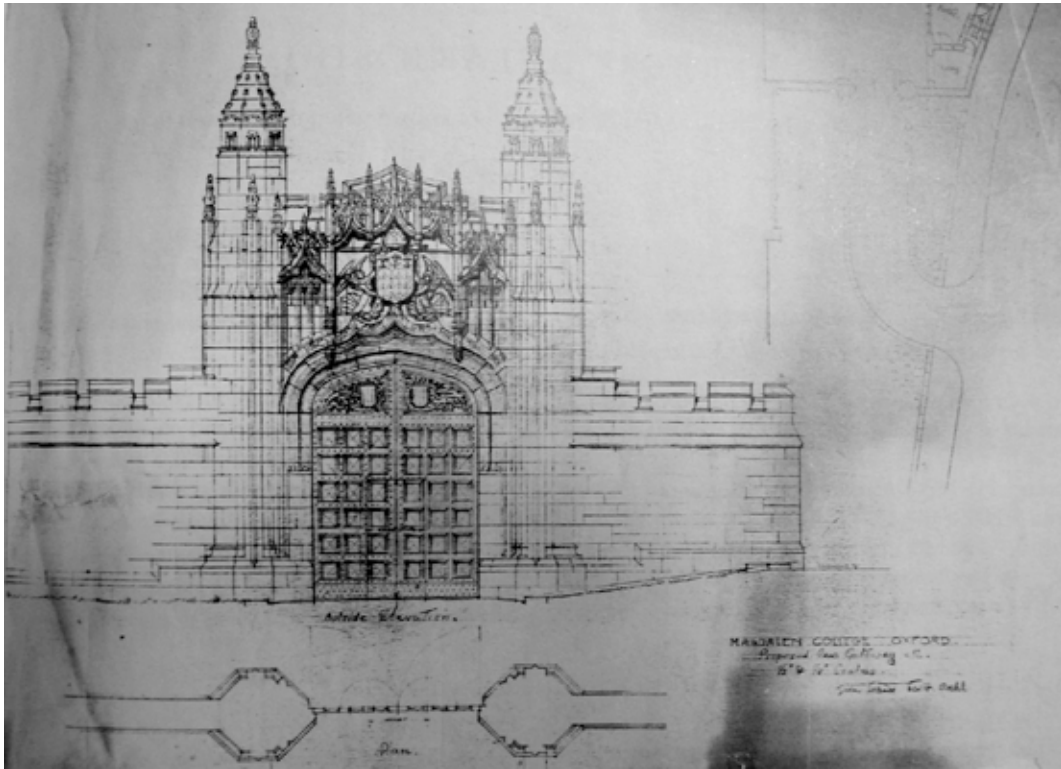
Unexecuted design for a High Street gate, Magdalen College. Magdalen College Archives.
